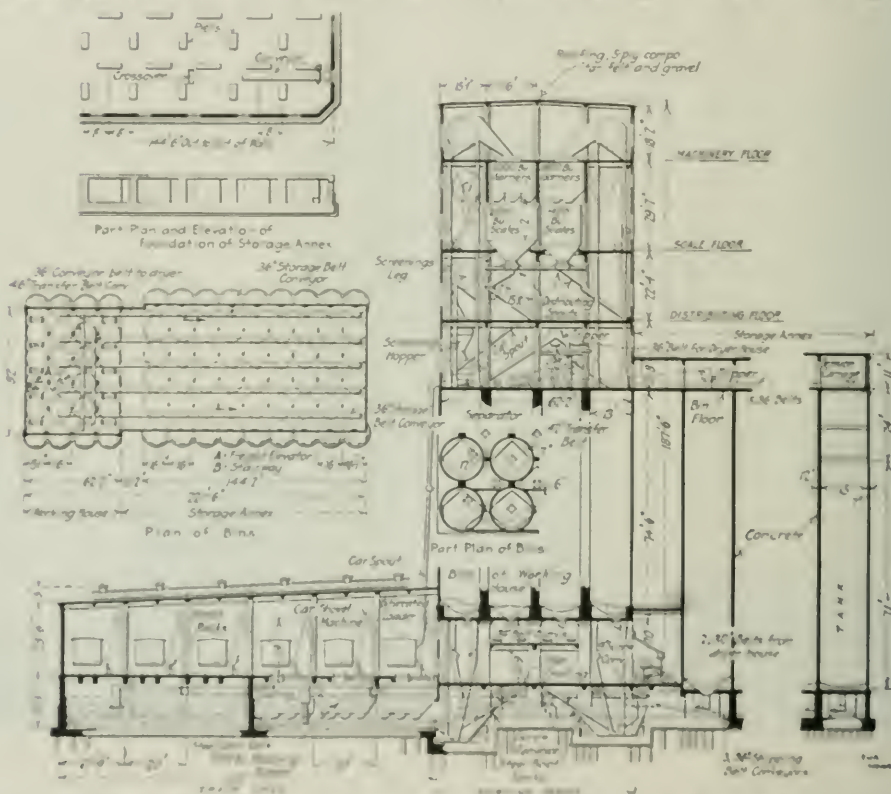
CROSS-SECTION AND DETAILS OF THE GRAND POINT GRAIN ELEVATOR
